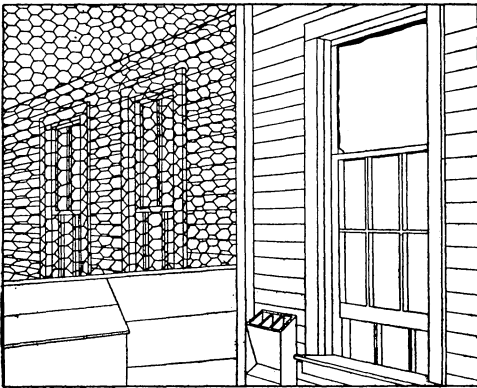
Interior of a New York poultry house, showing duck-covered window.
